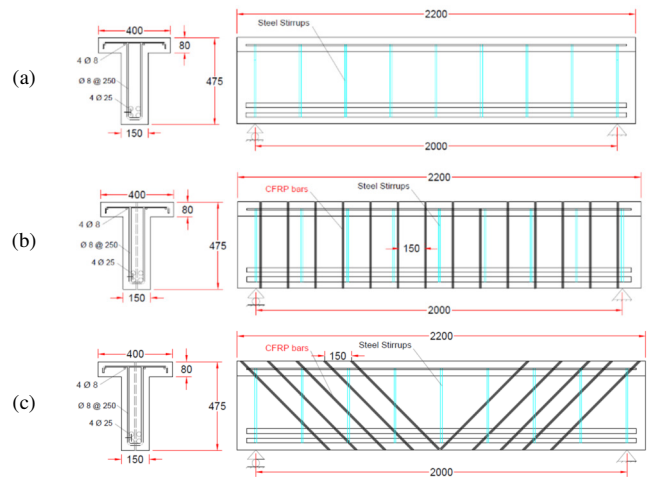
Details of the beams for group one (with stirrups) (all dimensions in mm): (a) Un-strengthened reference beam, (b) strengthened beam, (c) strengthened beam with inclined CFRP bars.
